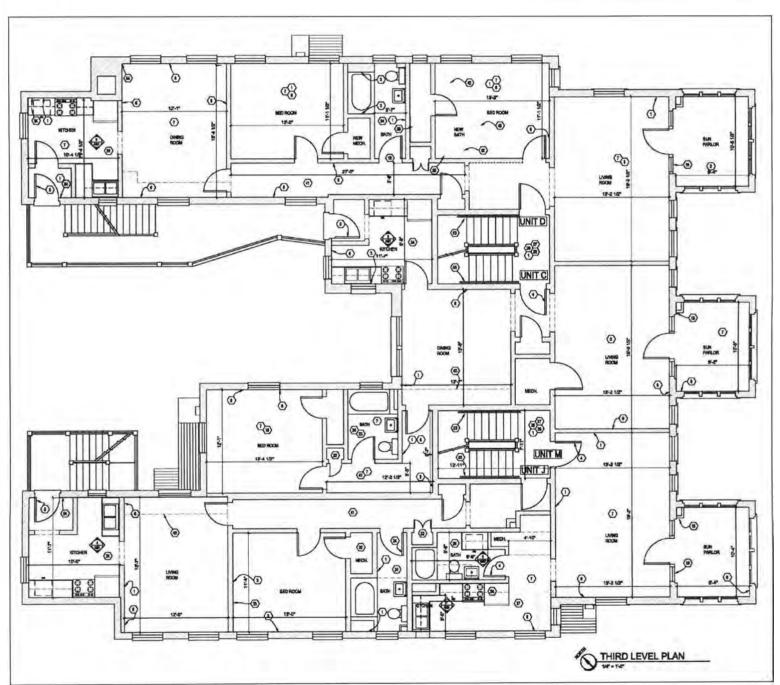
"Second"/third floor plan (OPN Architects, Cedar Rapids)
